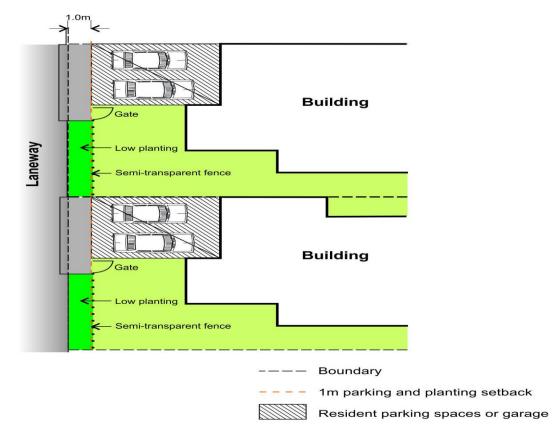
Garage Access - Restricted Residential Frontages in Laneways
